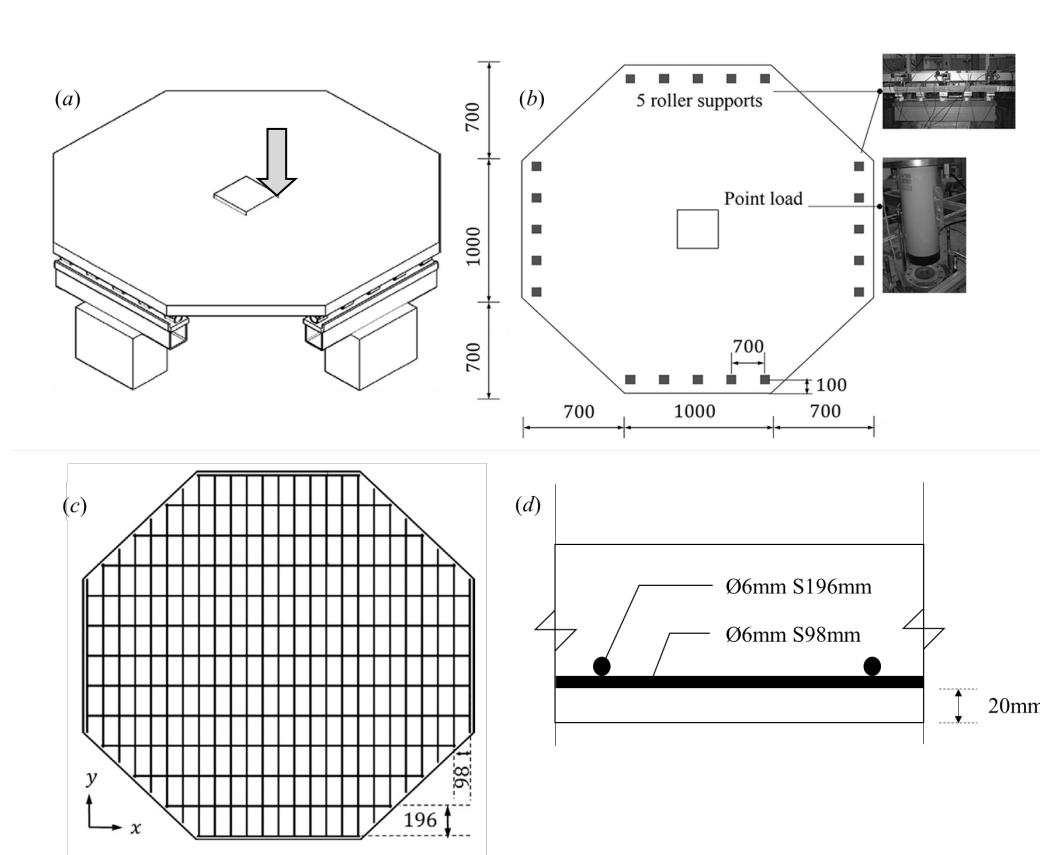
(a) Set-up of the test, (b) dimension of tested slab, dimensions in mm, (c) layout of reinforcement bar in plan (d) layout and concrete cover of reinforcement bar in vertical directions.
